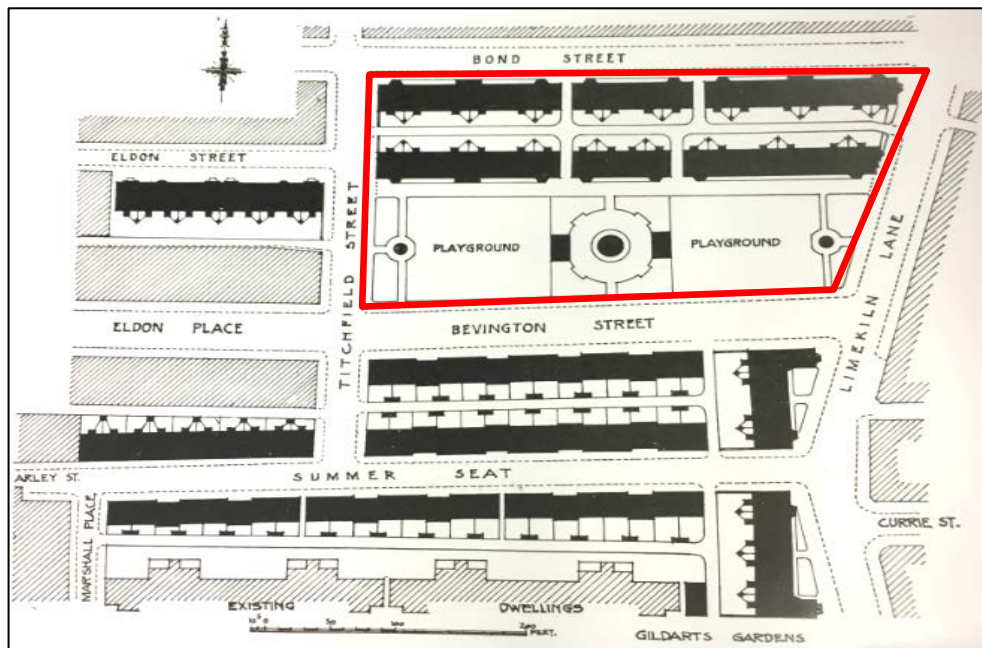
Plan of the Bevington Street area (following rebuilding) c.1912¹⁶
